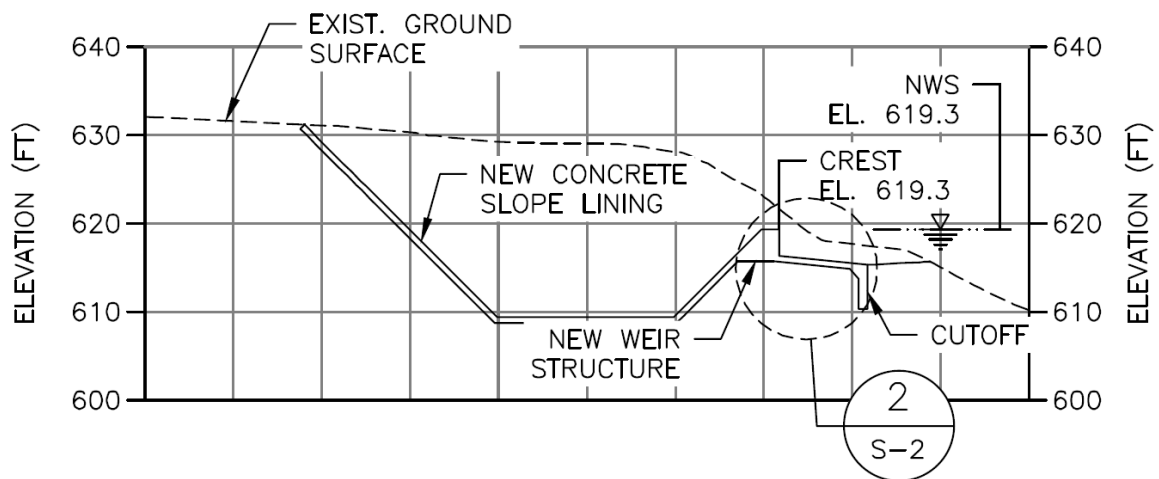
Plan and Profile of Spillway Crest Lengthening
